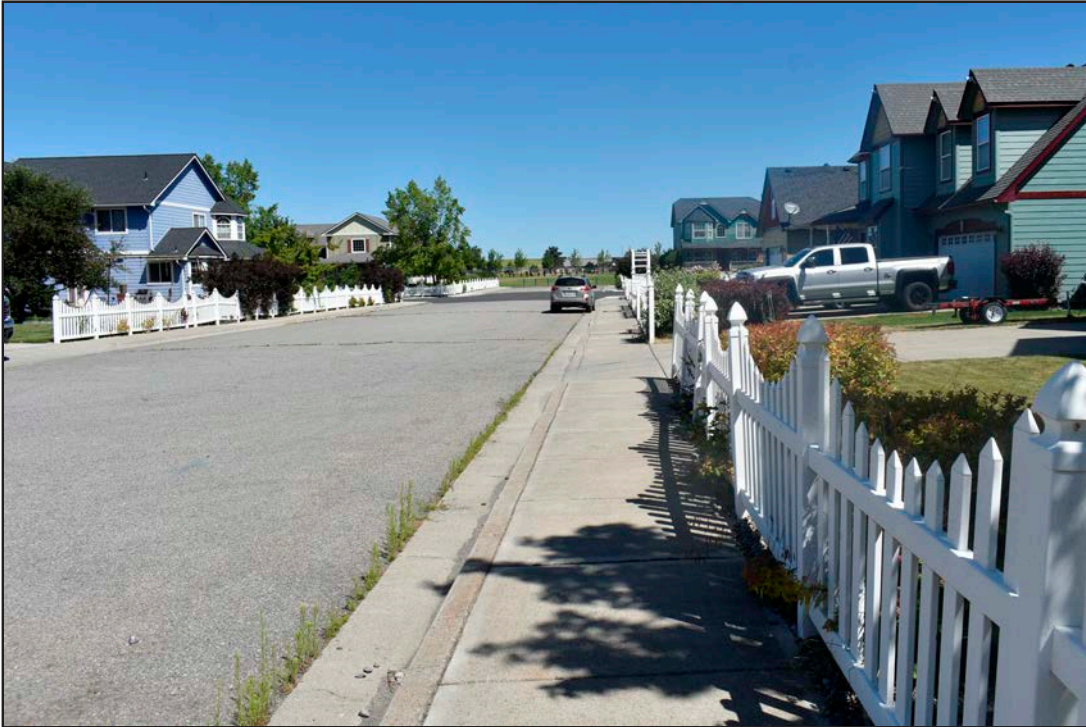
Typical view of North 8th Street, in a North Cheney residential neighborhood, where the project APE generally follows existing water mains under the sidewalk and road. The view is to the north.
